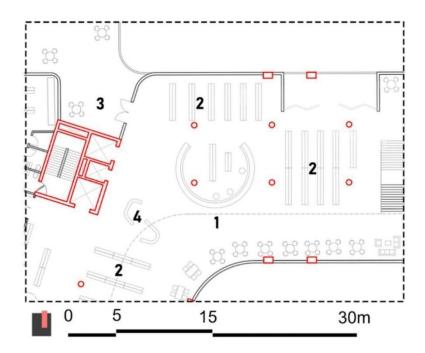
Blowup 2 of Third Floor Plan. Source: Author
